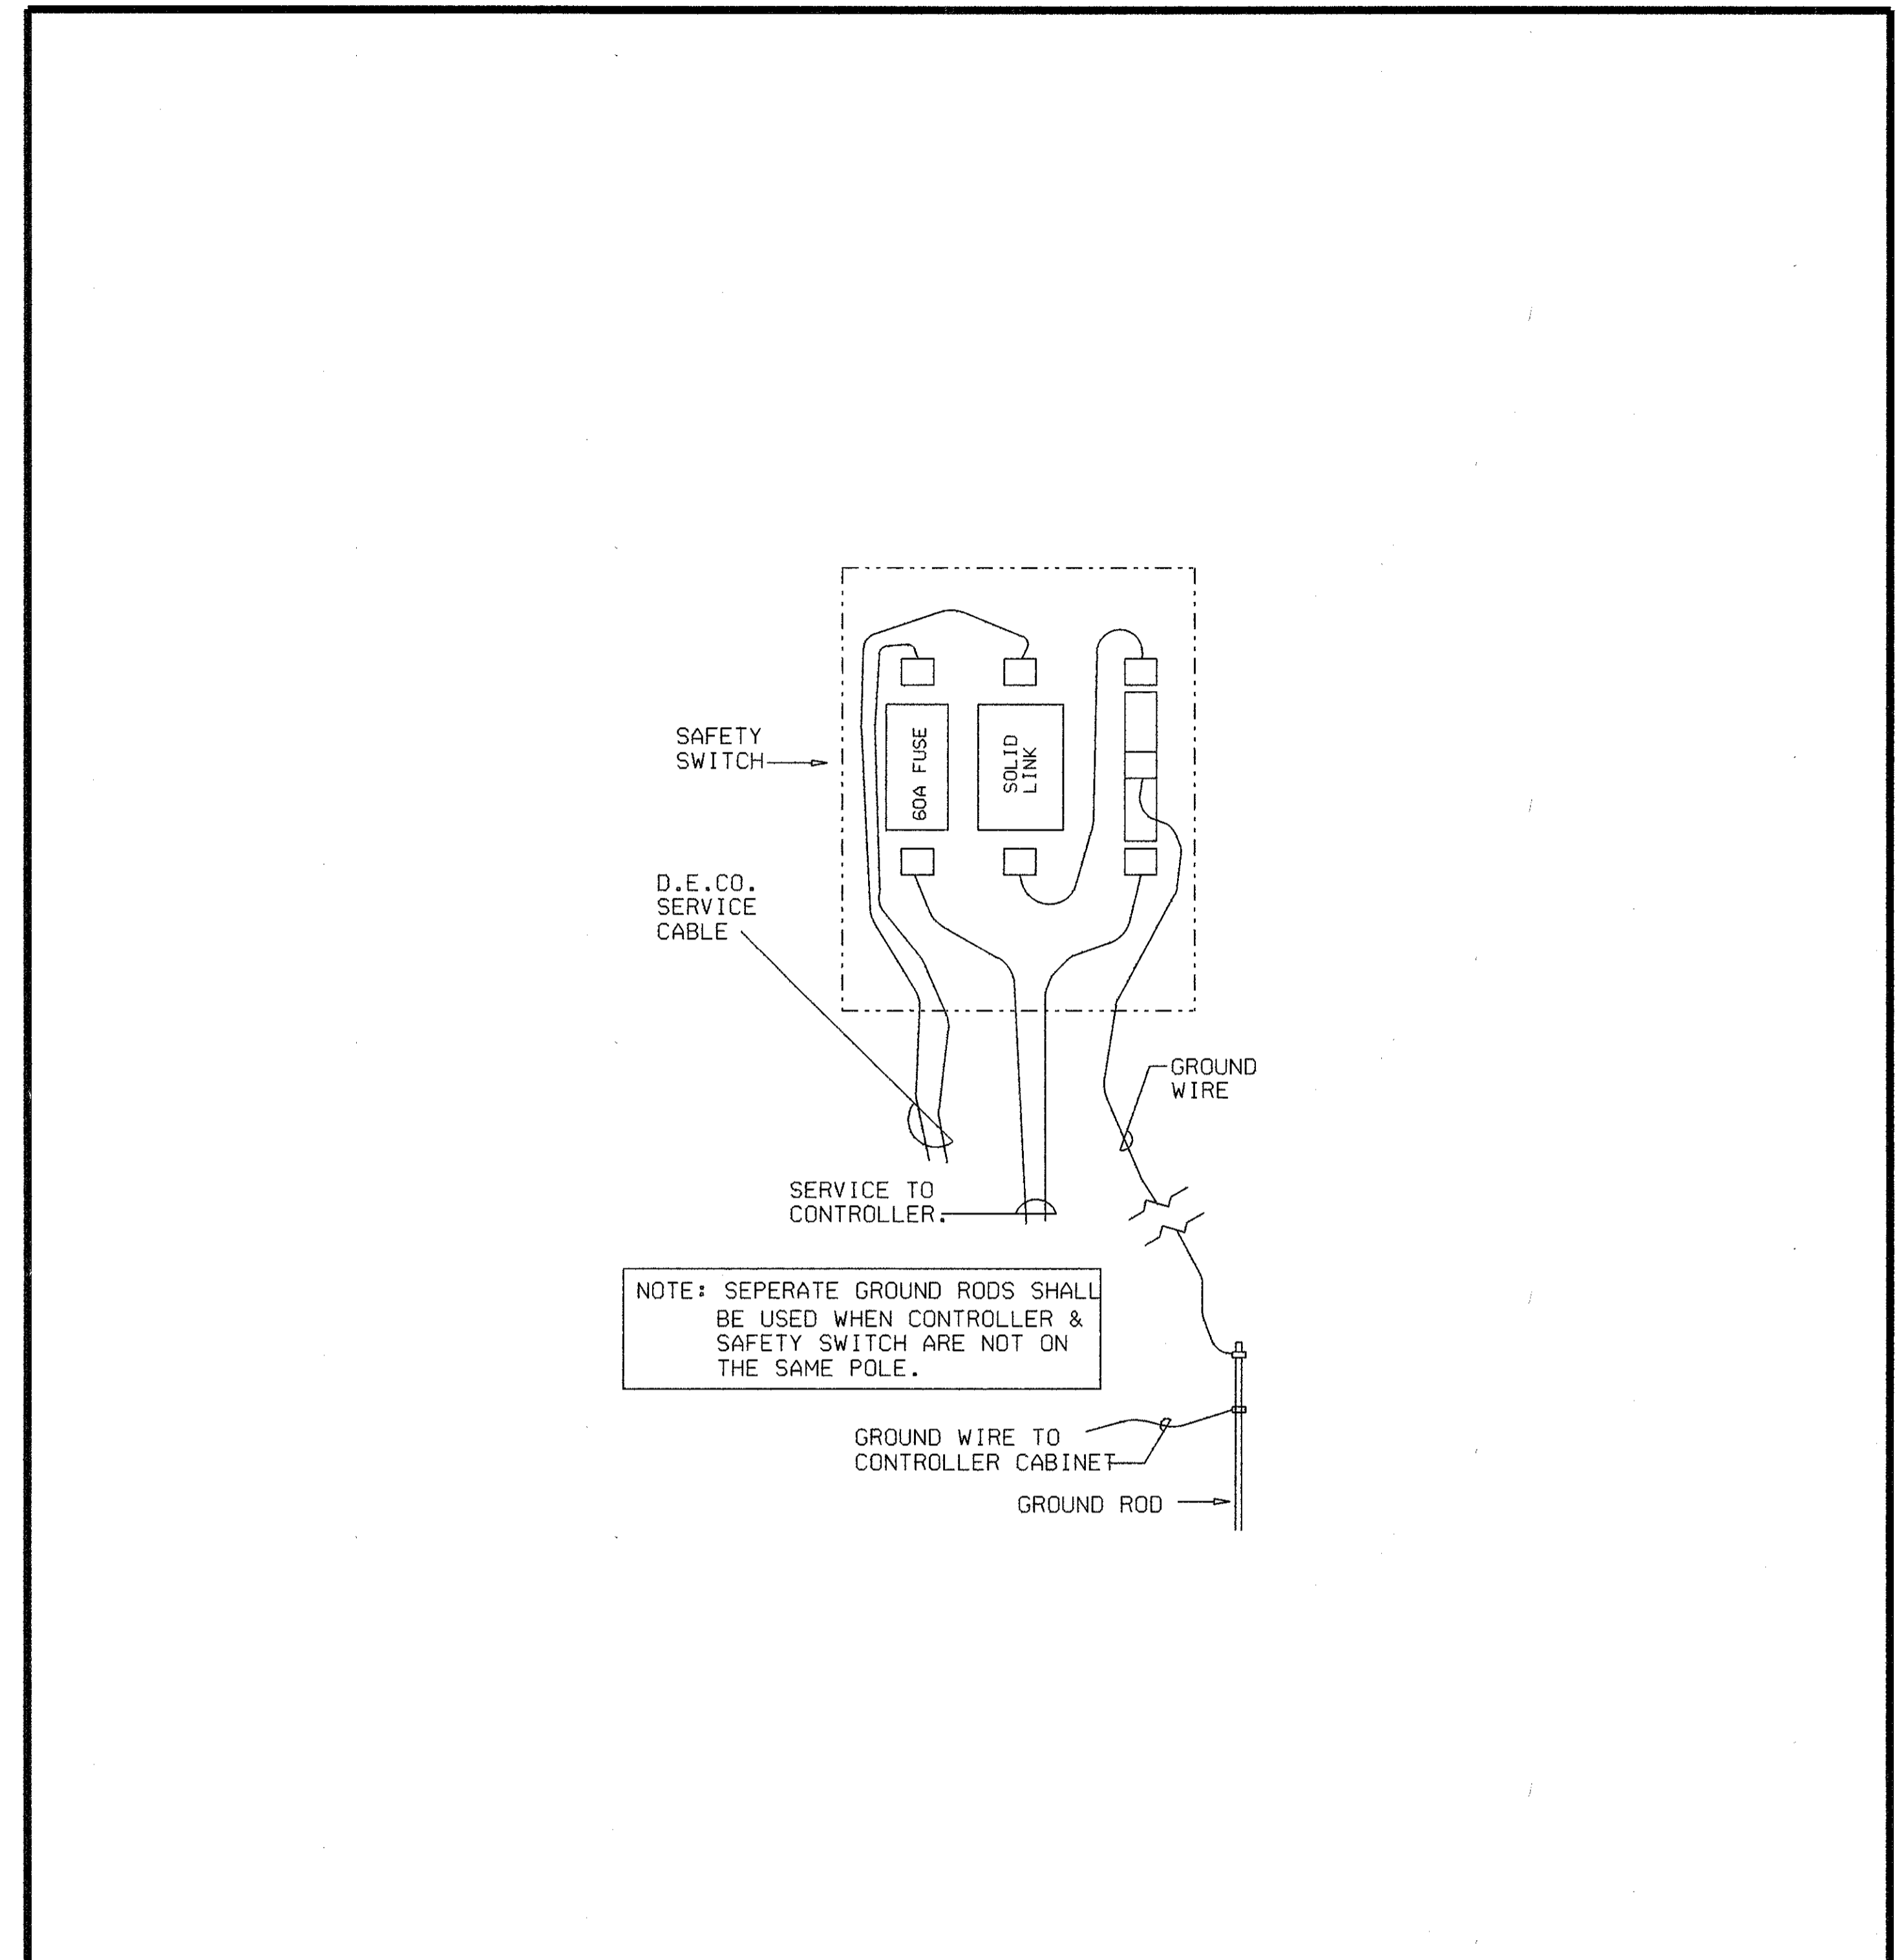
DETAIL : GROUND ROD INSTALLATION (N.T.S.)
